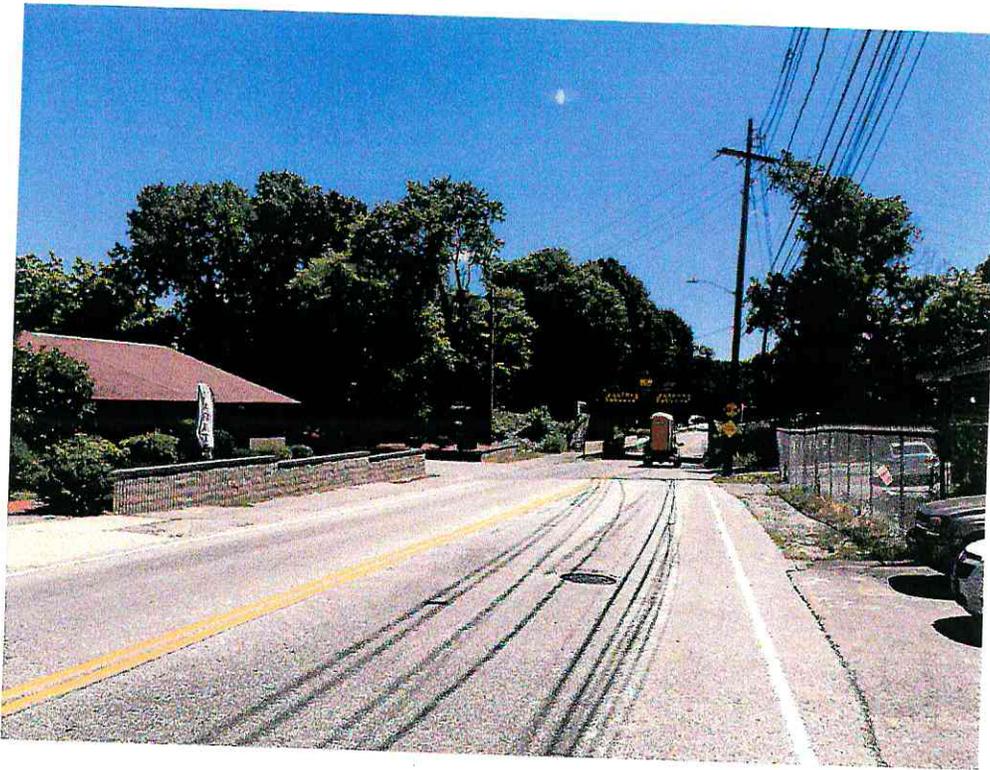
Location o – Cross St. looking east. 20' west of MBTA Bridge.
